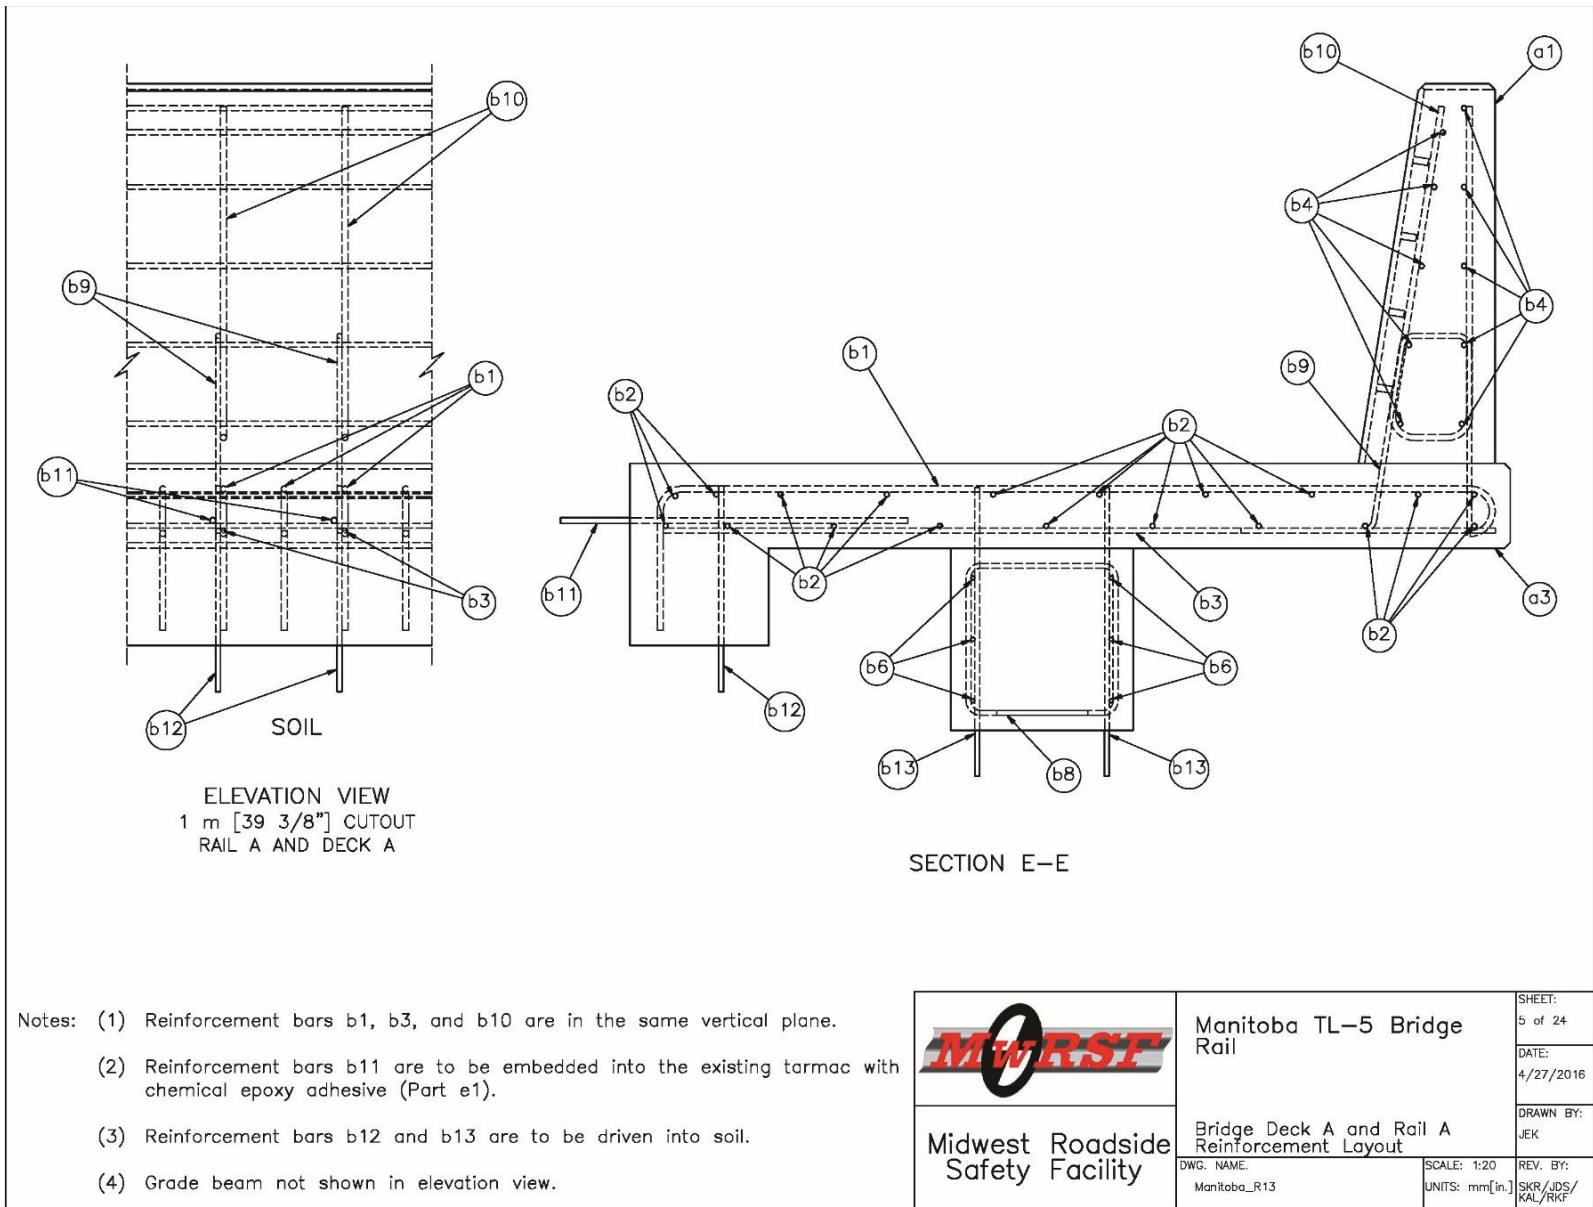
Bridge Deck A and Rail A Reinforcement Layout, Test No. MAN-1
